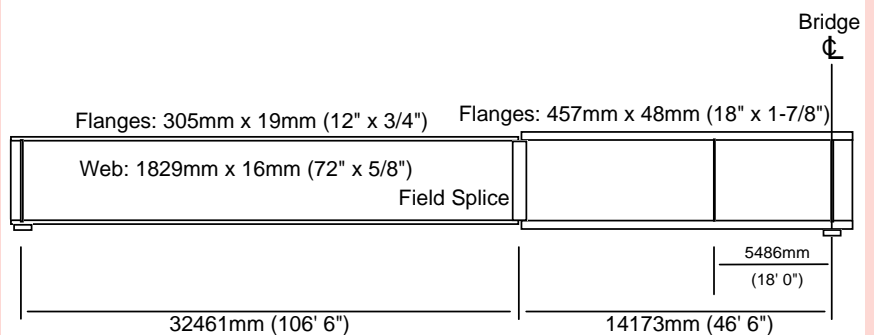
Elevation View of 7 Girder HPS Steel Bridge
